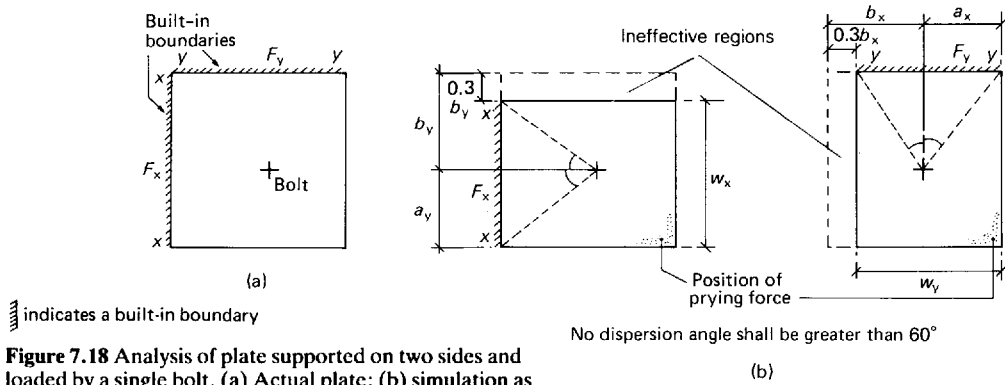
Analysis of plate supported on two sides and loaded by a single bolt. (a) Actual plate; (b) simulation as two cantilevers
